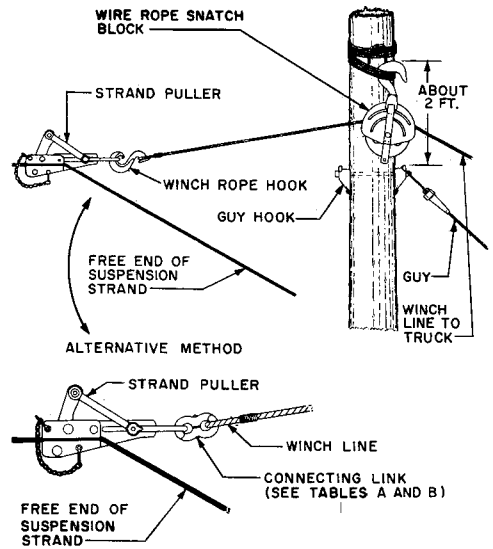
Pulling Up 6M or 10M Suspension Strand – Winch Line Method
